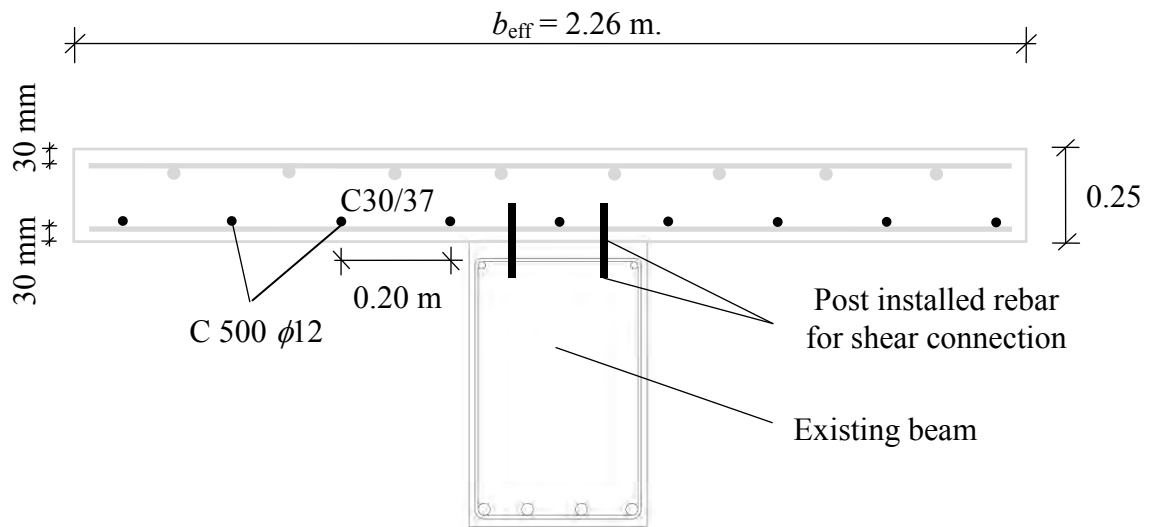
Cross-section according to the proposed intervention: new concrete slab connected to the existing beam
